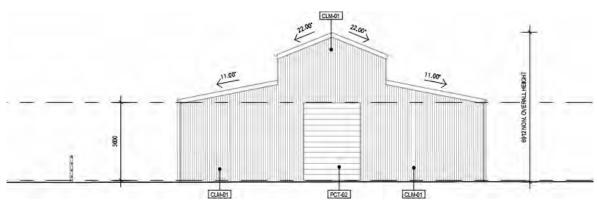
Rear elevation of machinery shed as seen from #70 OBrien Road (source: BB Design and Documentation, Proposed Shed Plans).
